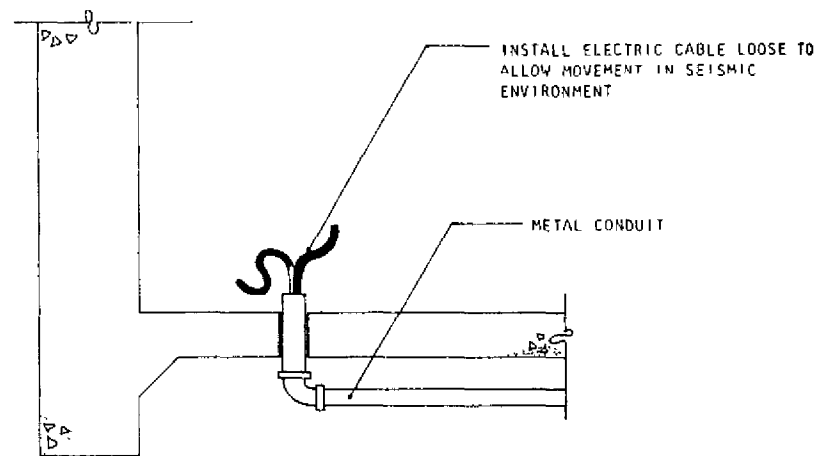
Emergency power supply systems. Electric cable installation.
